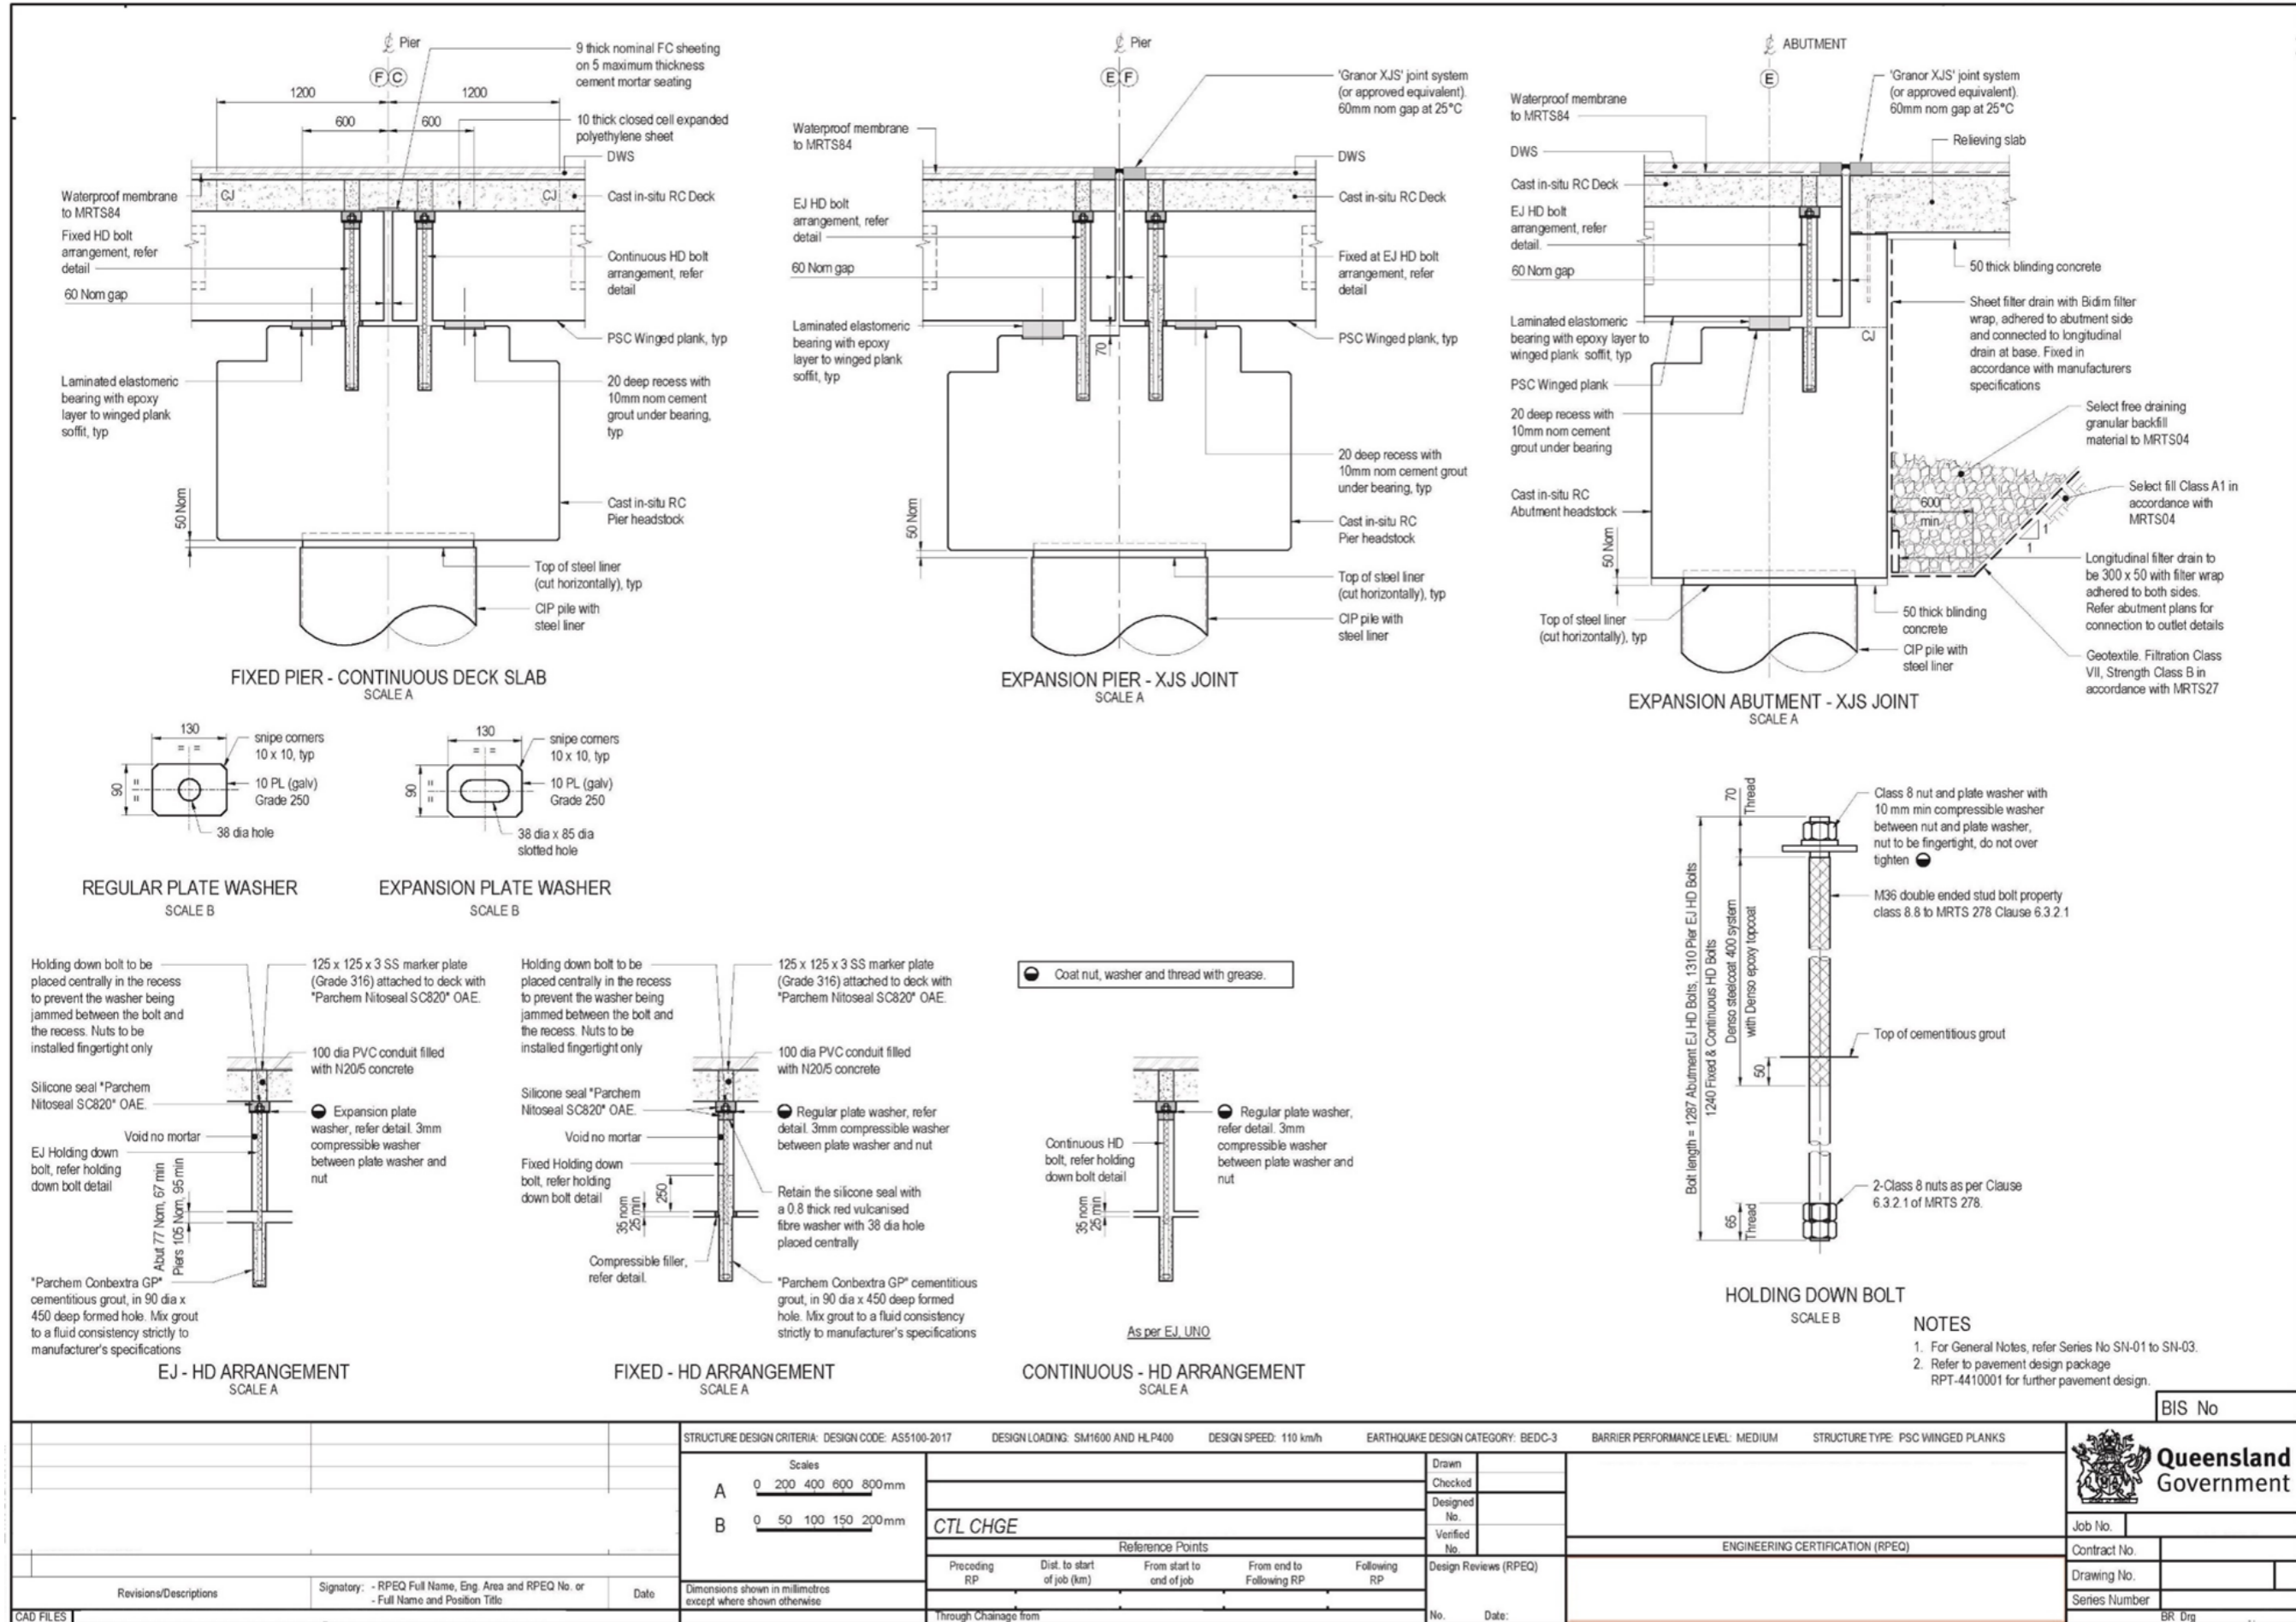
(k) - Example General Arrangement drawing 3 of 3 for winged plank bridge
